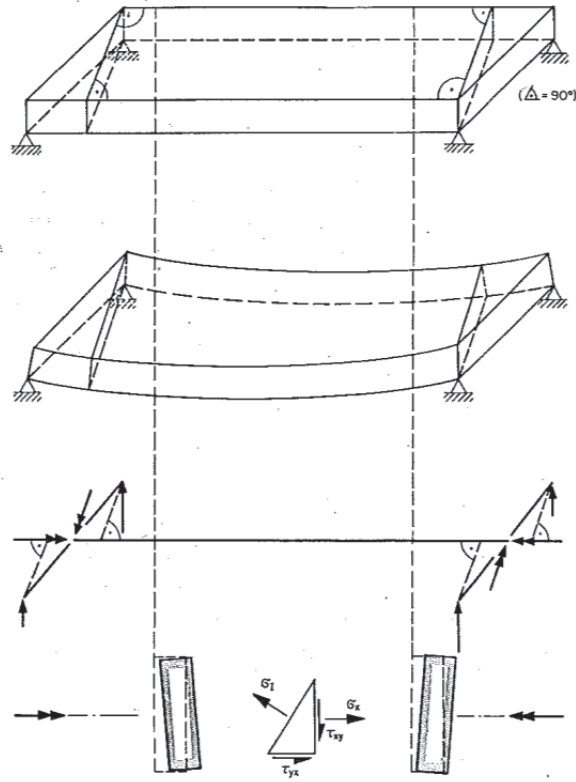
Structural Behavior of Skew Girder Bridges (Menn, 1990) Used under fair use, 2013
